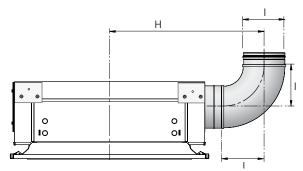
Connection with bend, viewed from end wall Mounted SYST CA xxx-90 connection piece
